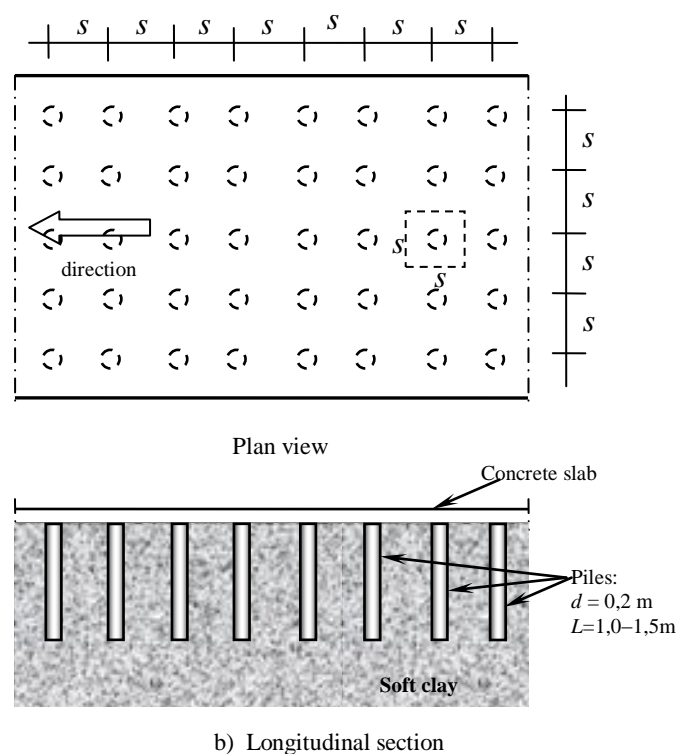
Typical of nailed-slab in rigid pavement construction (Hardiyatmo, 2008)
